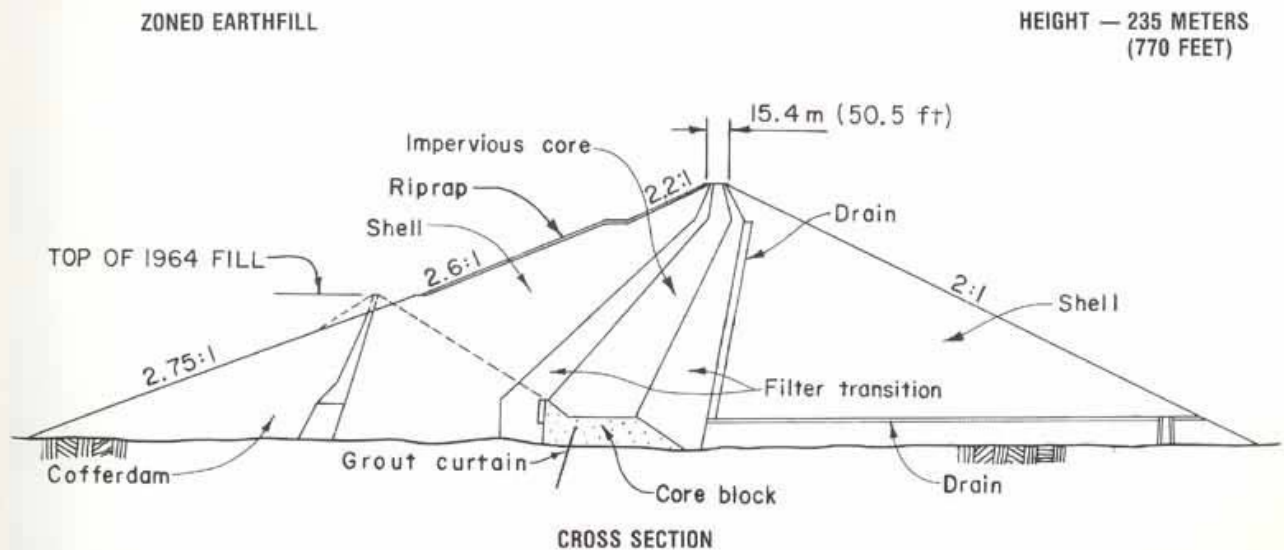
Oroville Dam, plan and cross section (2 of 2). P-801-D-79336.
